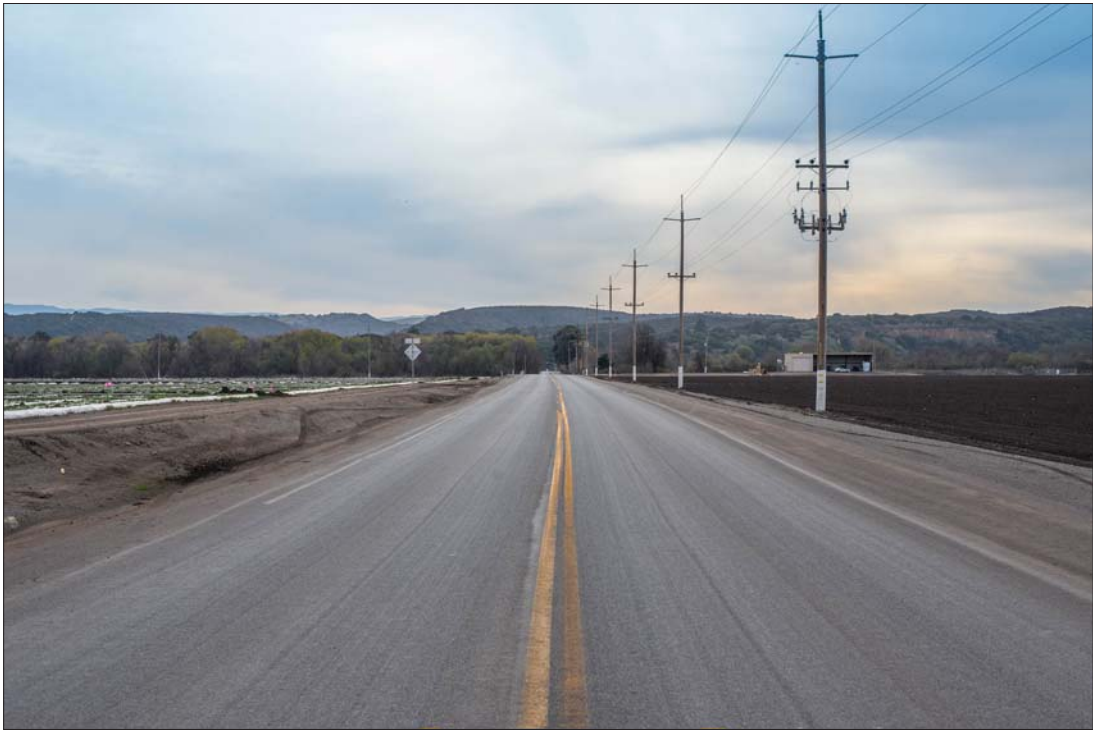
Viewpoint 2, Near Proposed Bridge Site Looking Southwest, Existing View
